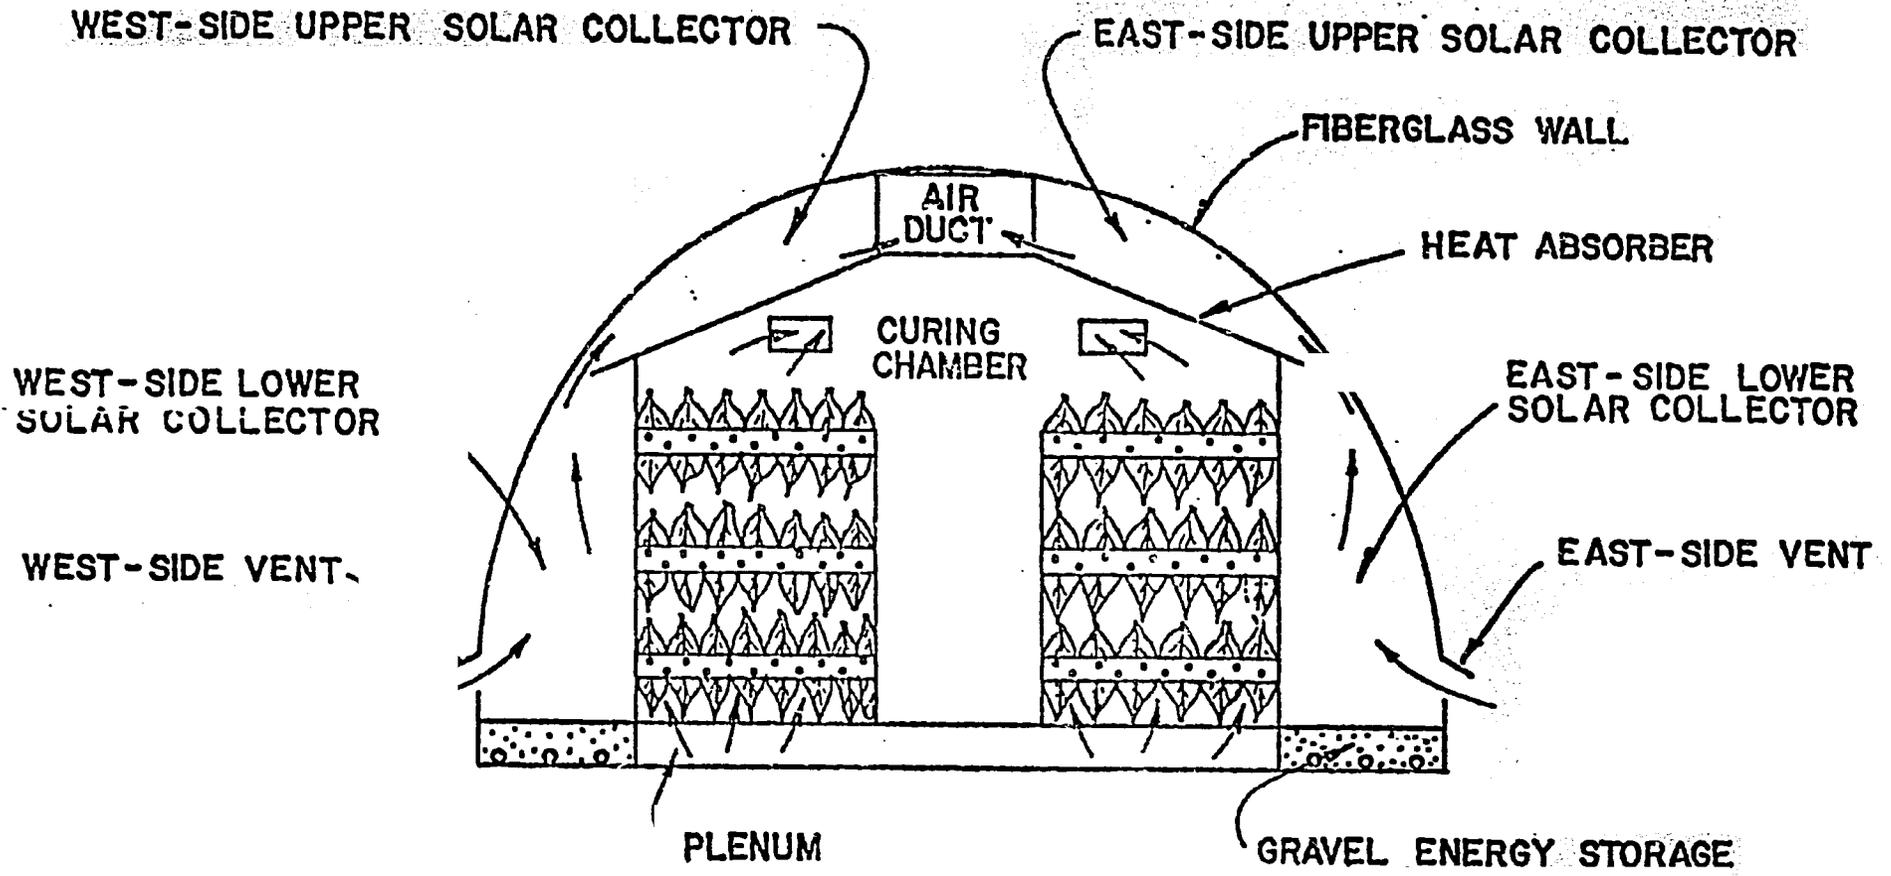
Schematic cross-sectional view of greenhouse bulk curing solar barn.
